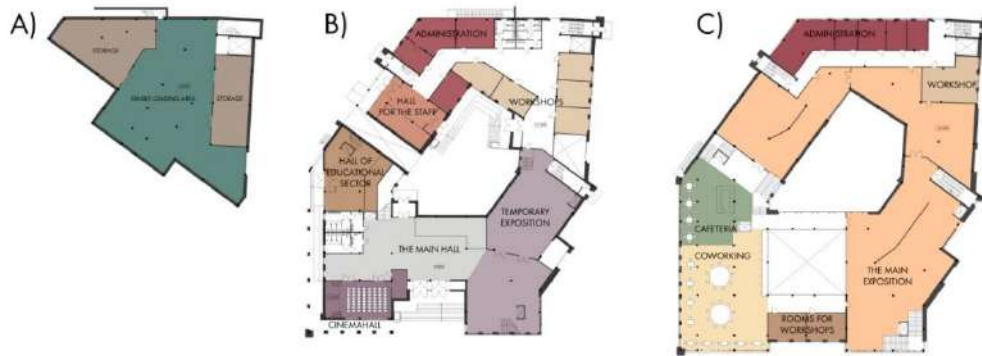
Floor plans: A) basement; B) first floor; C) second floor
